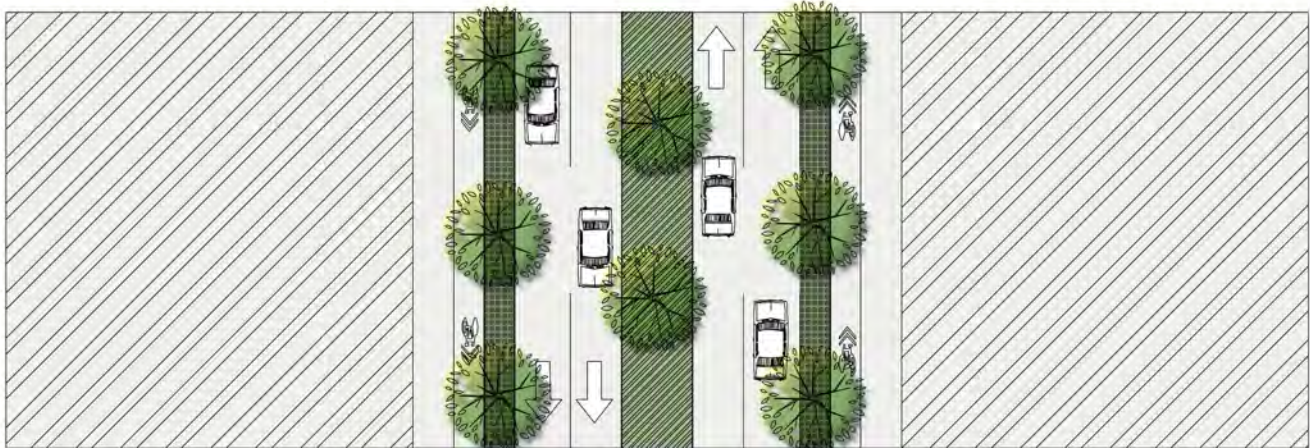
Section, Historic Boulevard: The “Historic Boulevard” street section reflects the recommended design for Manchester Road in the historic portion of Manchester. Over time, following the installation of back streets and other access management improvements, the community could install a landscaped median as redevelopment projects progress. A combined bike and pedestrian lane on either side of Manchester Road would provide for connectivity east and west and would also serve businesses and residences on either side of the street. Given the close proximity of existing buildings to Manchester Road, this street section does not anticipate providing parking in front of any structure. In contrast, parking would be provided to the rear or the side of individual buildings.
